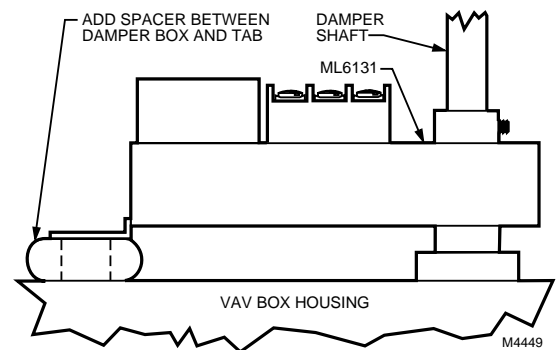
Mounting actuator to VAV box when actuator is not flush with box.
